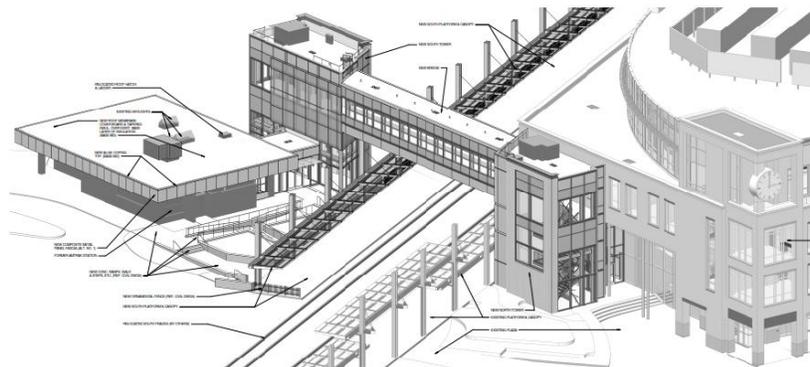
Alternative 2 Enclosed Passenger Overpass (Ratio Architects)
